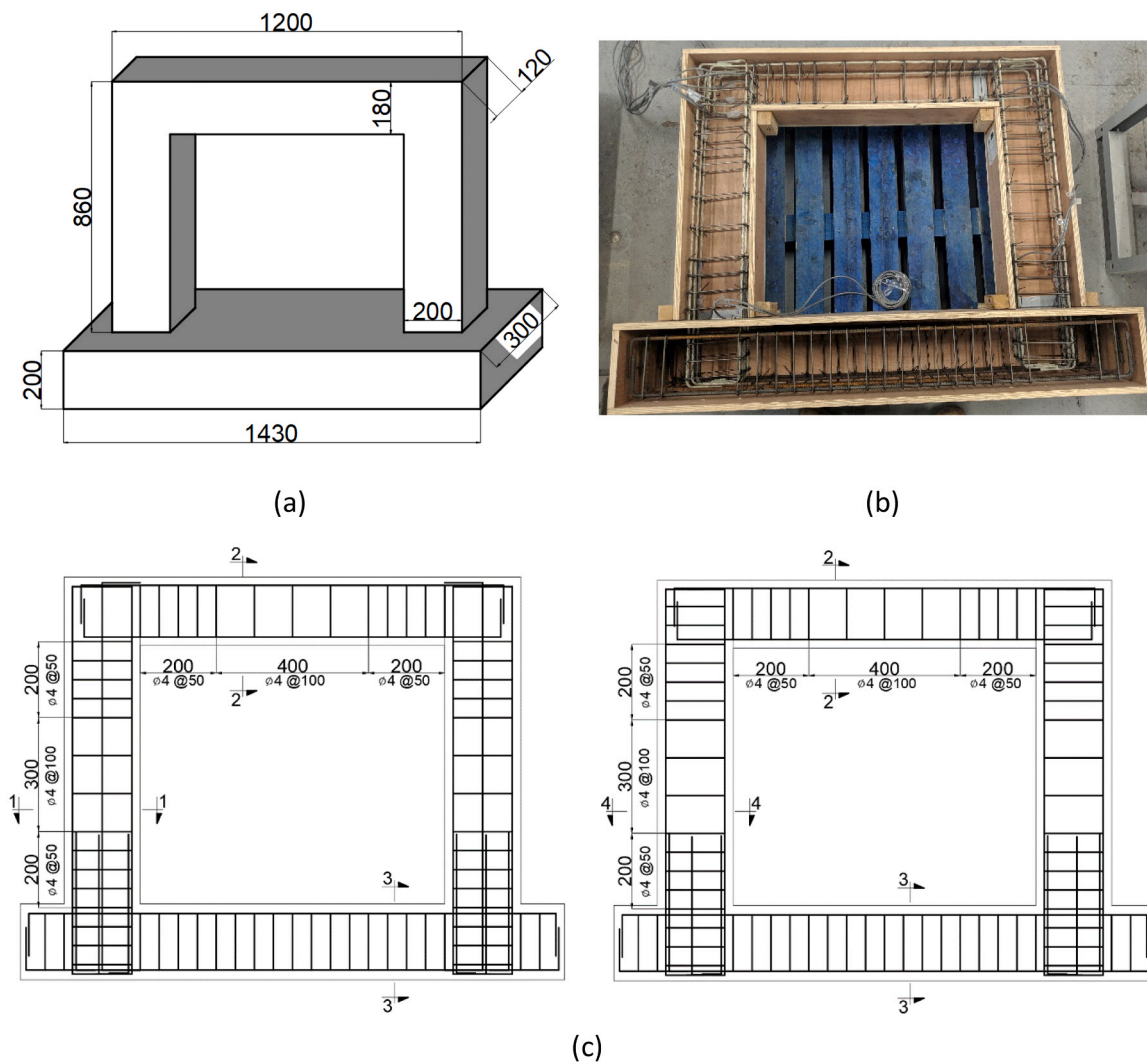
Details of test specimens: (a) overall dimensions for all specimens, (b) photo of specimens, (c) reinforcement details.
